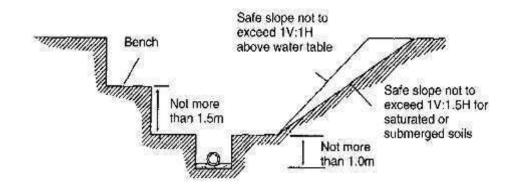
Excavation Face Benched and Battered to a Safe Slope
